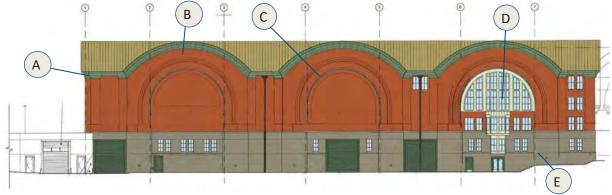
Excerpted from the 2002 brick veneer water repellent project this drawing of the east elevation of the building shows an overview of the typical cladding systems. A. Sheet Metal Cornice, B. Brick Veneer Cladding, C. Aluminum Panel Cladding, D. Aluminum Storefront Window Assemblies, E. Cast-in-Place Concrete Foundation Wall.
